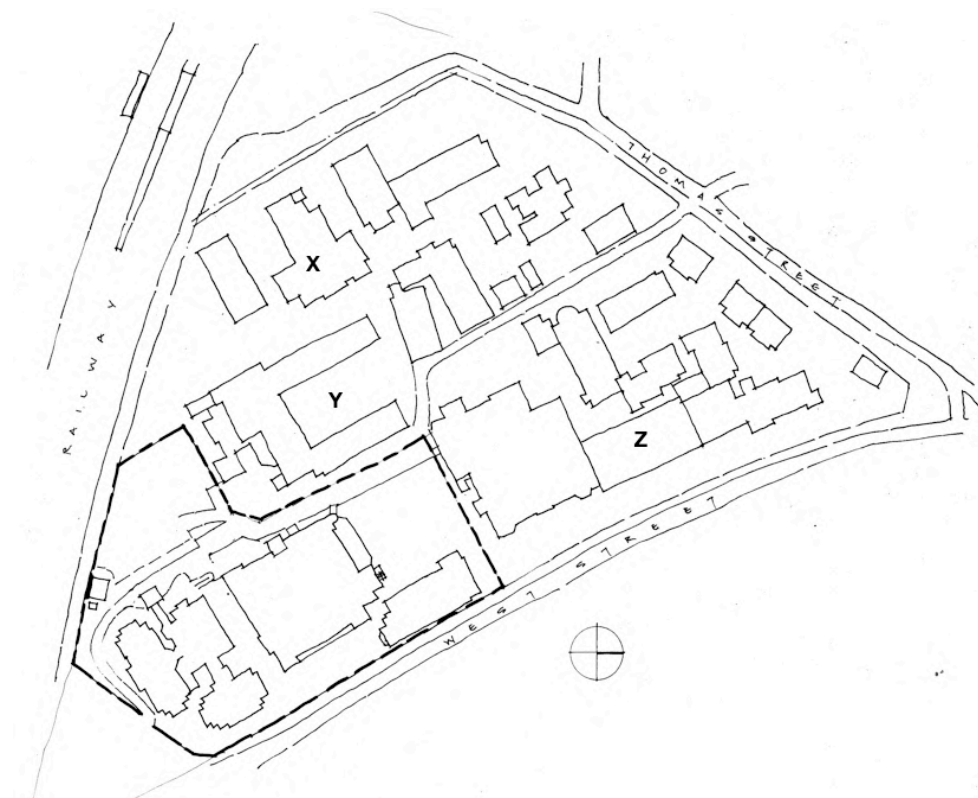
Lewisham Aged Care - Location Plan. Site highlighted by author
